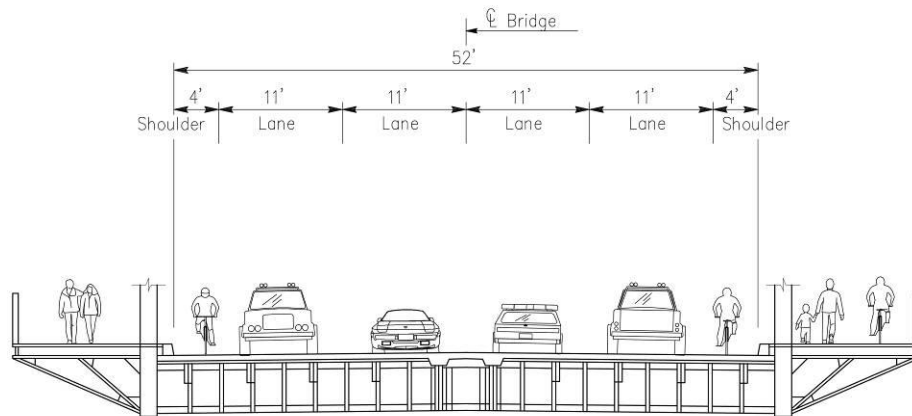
Typical Section of Tower Bridge showing existing lane configuration (and proposed sidewalk widening) -two through traffic lanes in each direction with shoulders.
